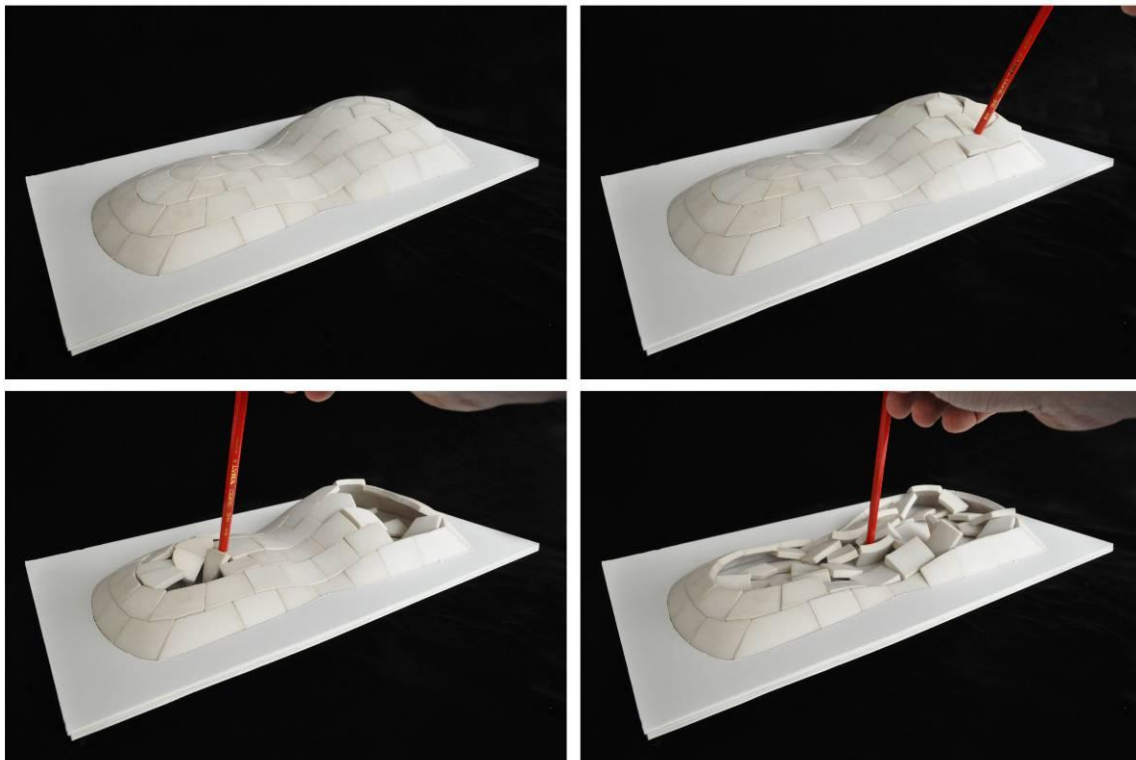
Collapse sequence of a masonry vault model under point loads.
